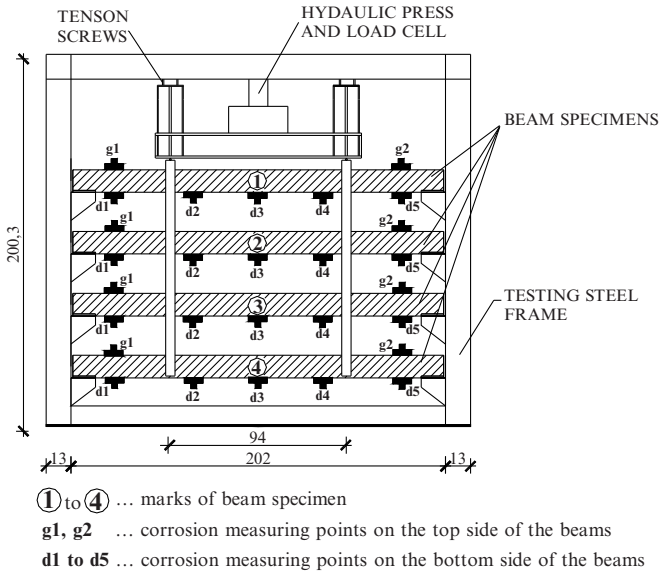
Beam specimens in the testing frame and corrosion measurement points
